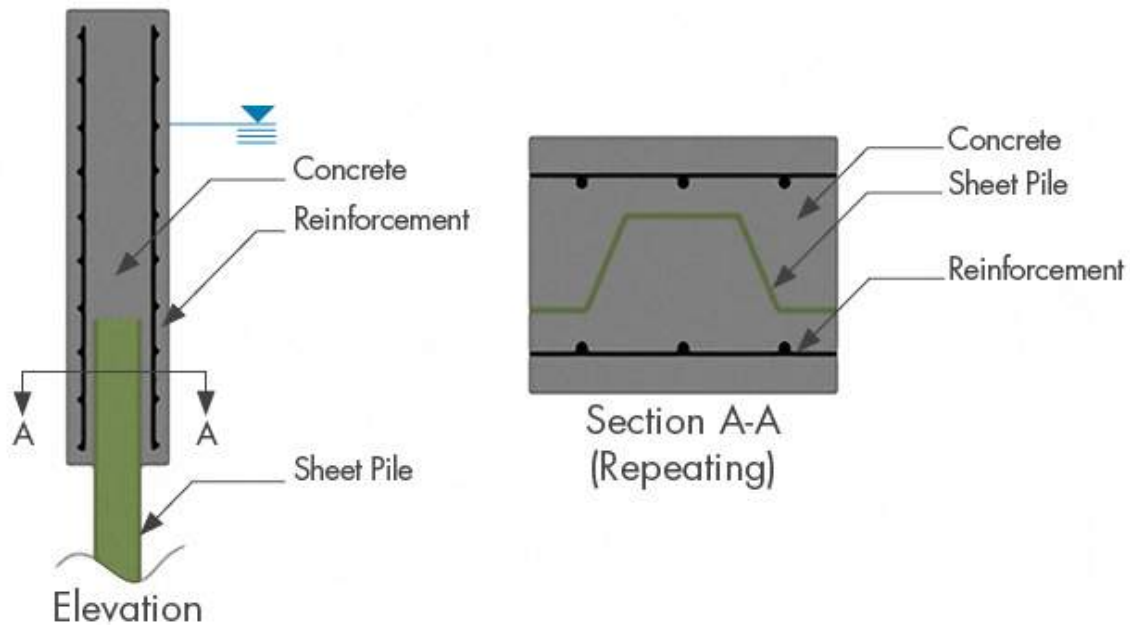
Concrete and Sheet Piling Floodwall (Kjolsing, 2019)
